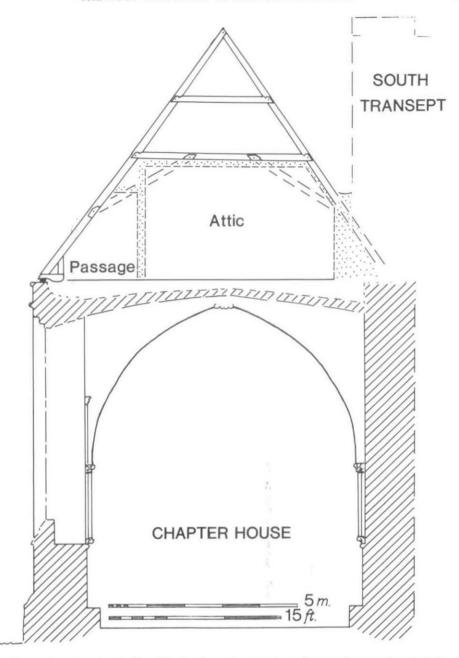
Chapter-house: section looking W., showing attic rooms in roof-space above vault and relationship to S. transept.
